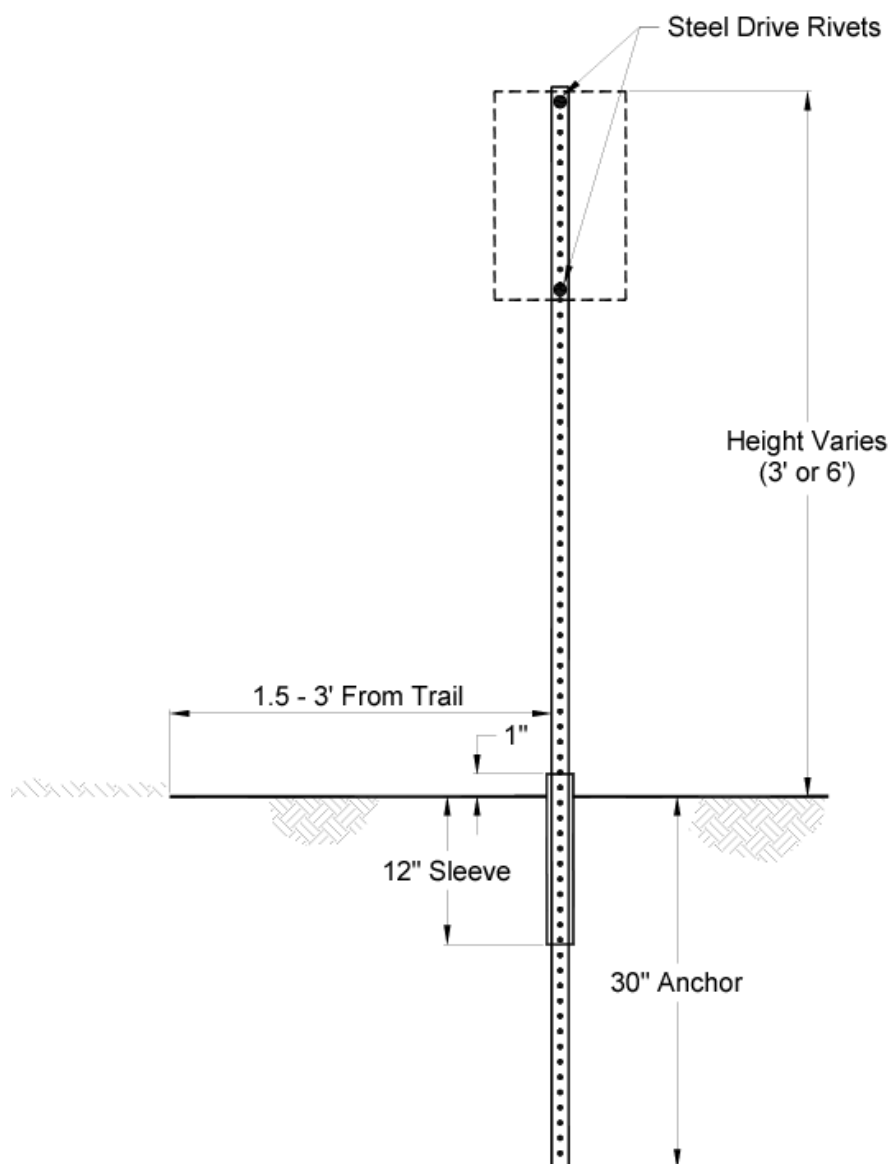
TRAIL SIGN INSTALLATION
